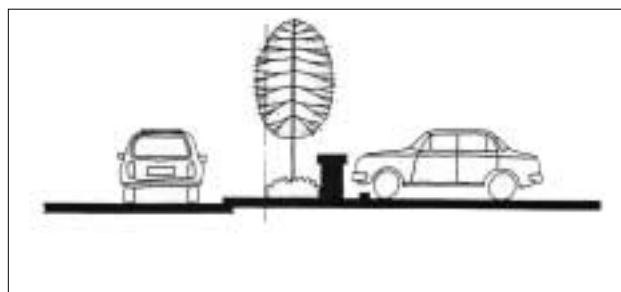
Walls and plantings along parking lots at street edge help reduce the visual impact of parking lots from the street.
